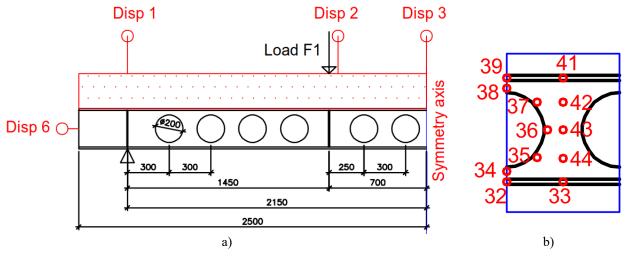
a) Detail information of the beam and cell geometry, left half of the beam b) Thermocouple positions at beam mid-span.
